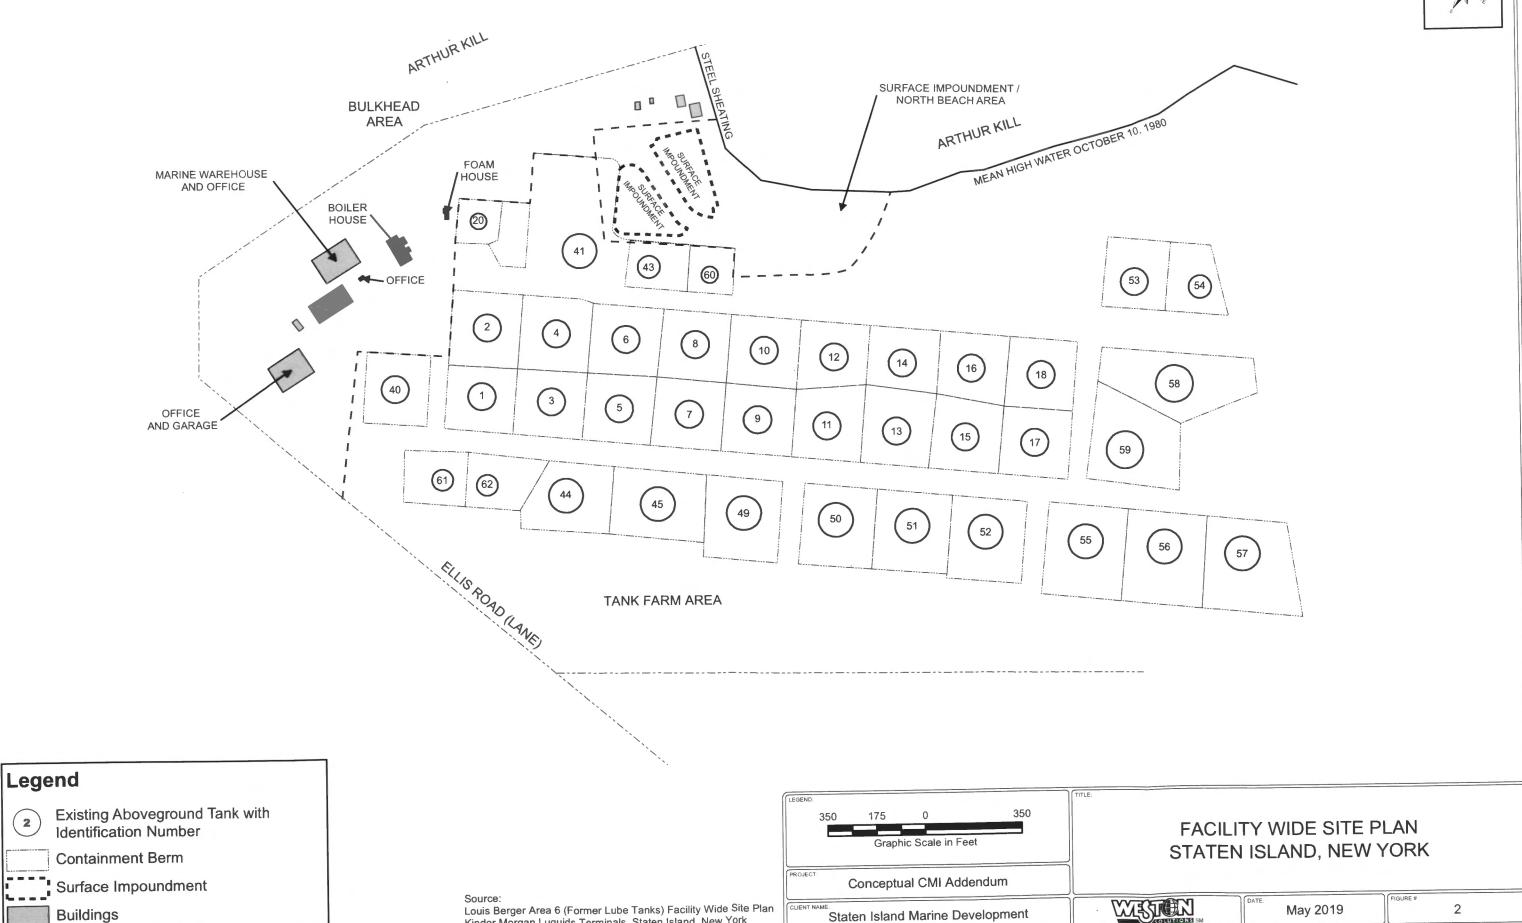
Site Plan (excerpted from Corrective Measures Implementation Workplan Addendum, Conceptual Plan, Weston 2019)
